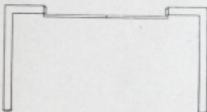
Floor plan showing doors in closed position equipped with "SlydaSyde" FF hardware.
